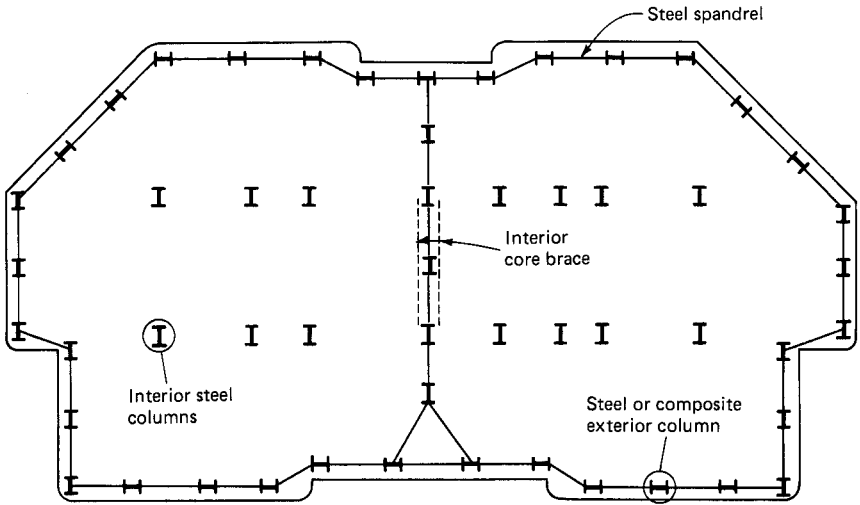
Twin tube system with 20-ft (6.1-m) column spacing.
